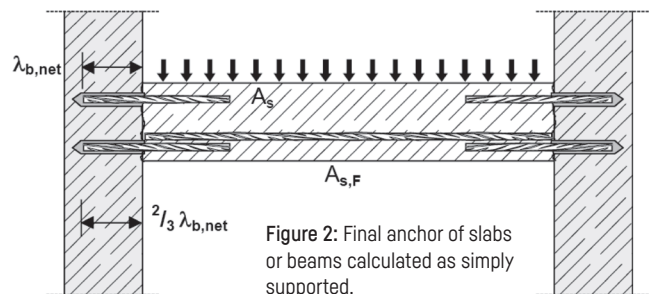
Final anchor of slabs or beams calculated as simply supported.
